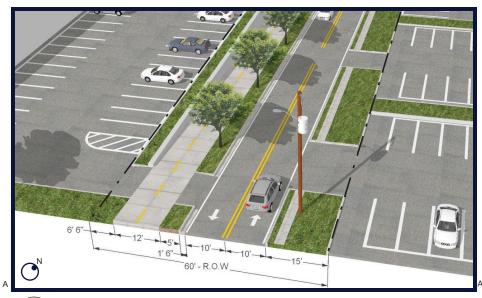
illustrates the existing conditions of the alternative route proposed to extend the Rail-Trail east/southeast from Broad Street to Peachtree Road. This alternative route is proposed within the Broad Street R.O.W. The 60' R.O.W. is made up of a 30' roadway with three 10'-wide travel lanes. On either side, 15' landscaped buffers line the corridor. Within the 15' landscaped buffers of the R.O.W. are power lines, parking lots, and a variety of deciduous and evergreen trees.
